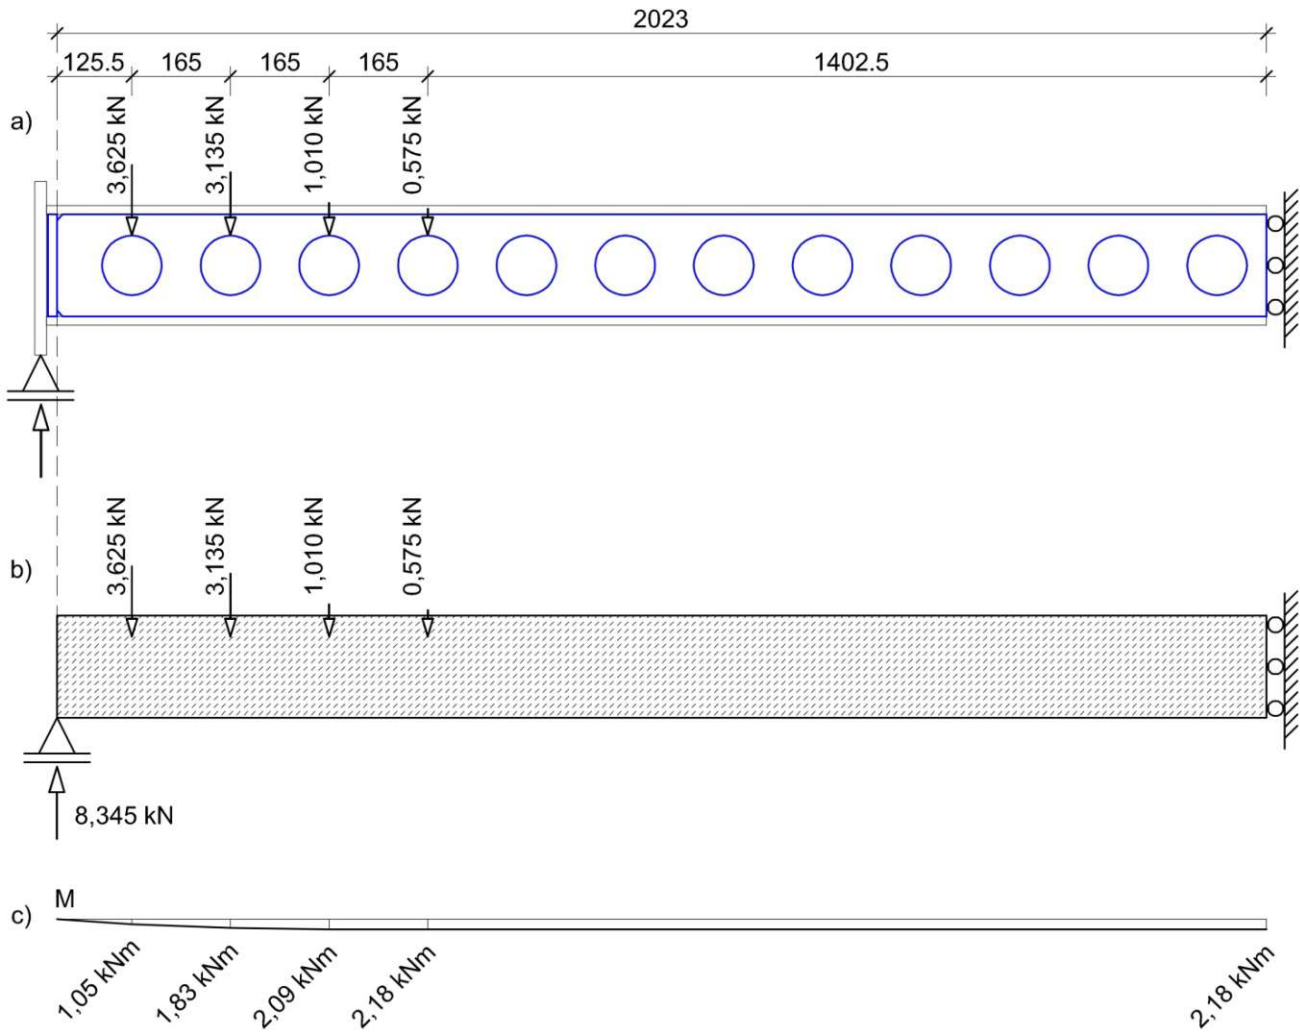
Model design for concrete next to the outside shear connector: a) concentrated vertical loads at the holes of the shear connector of the bottom steel section; b) the loaded concrete beam; c) bending moment diagram. Dimensions in [mm]
